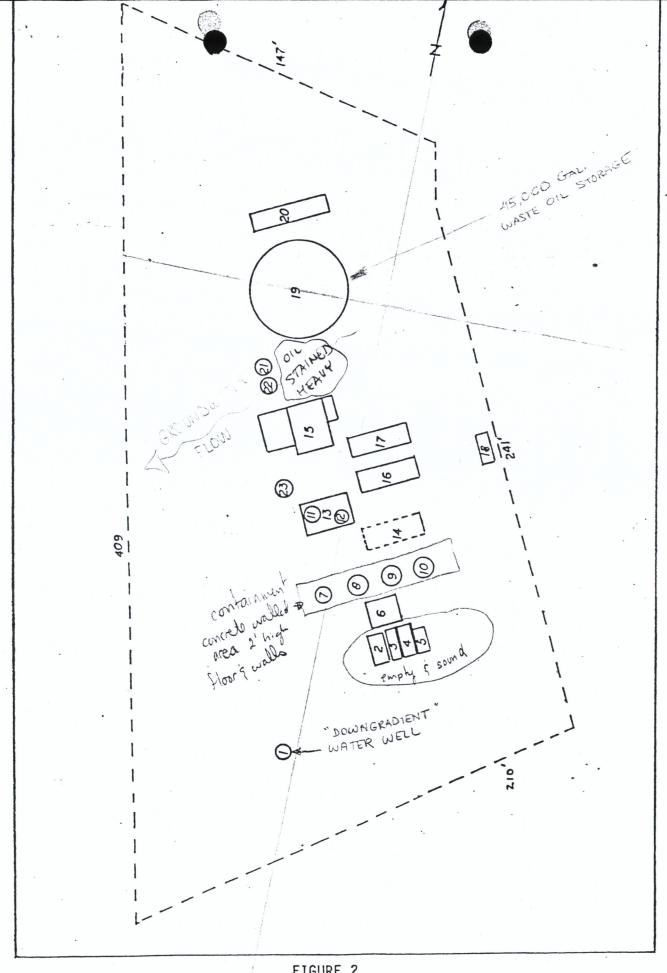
SITE PLAN ARRCOM RATHDRUM, IDAHO
